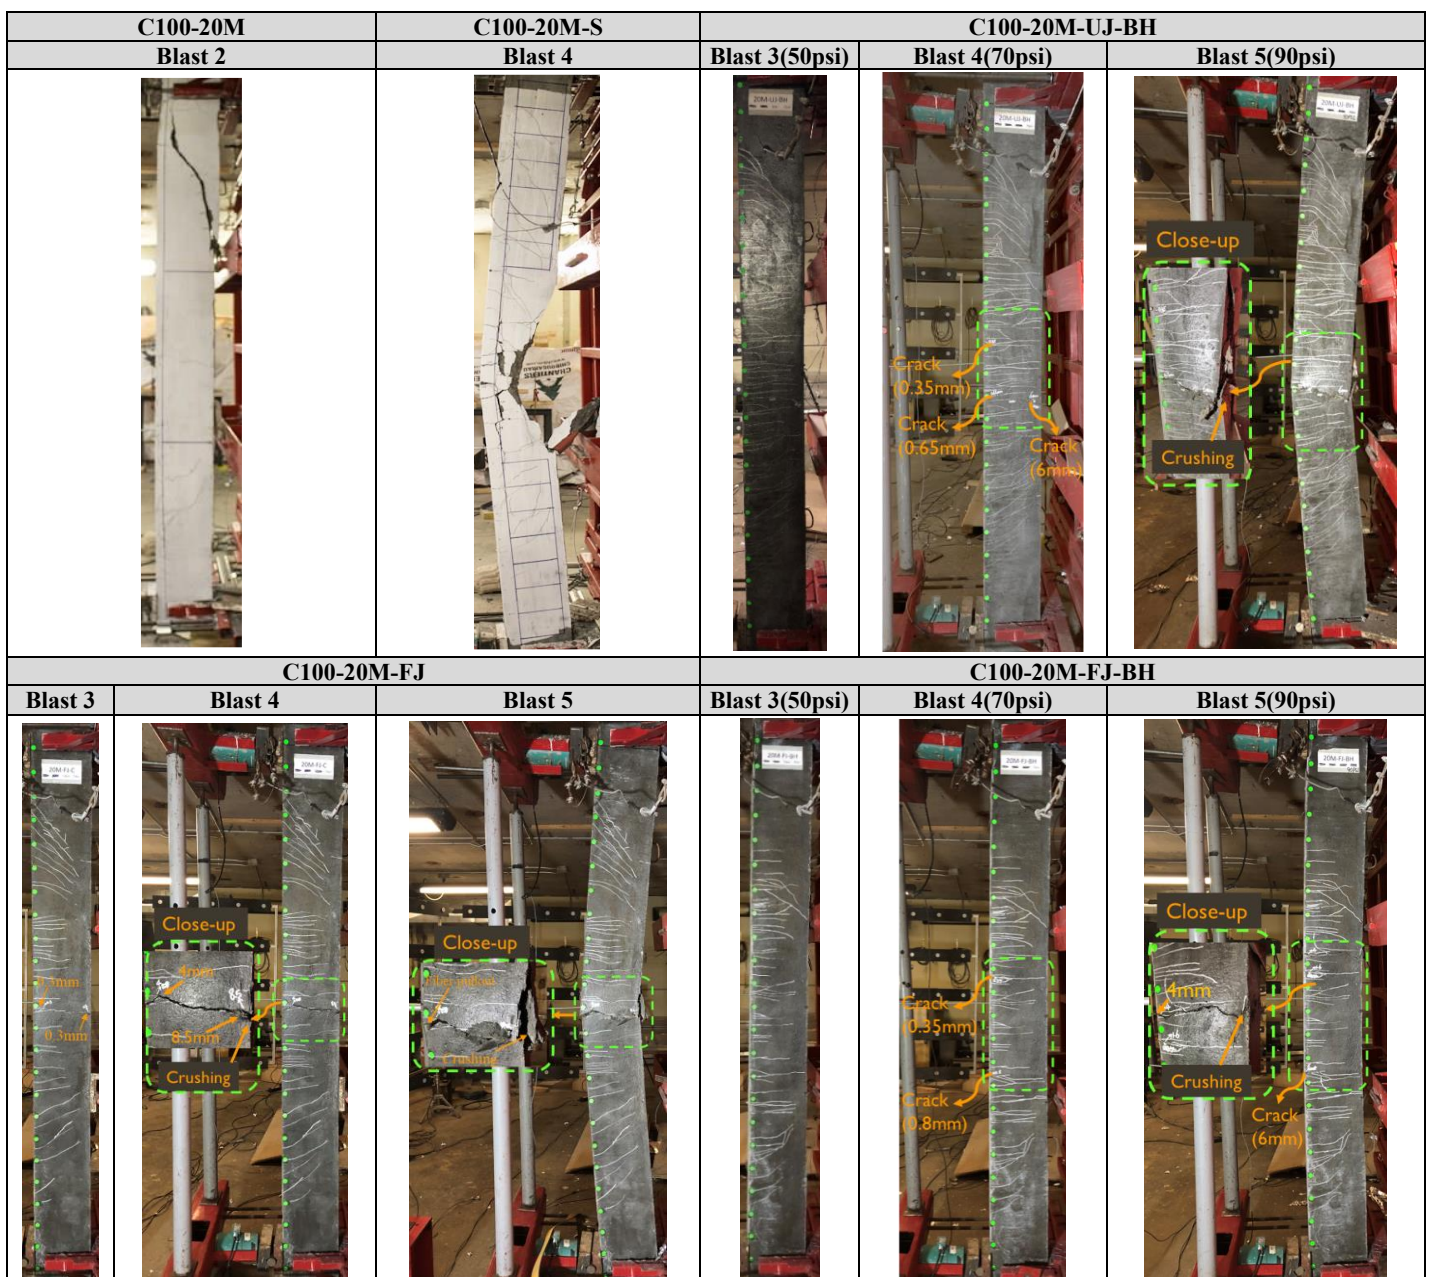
9 Damage profiles of specimens with 20M (no stirrups)
